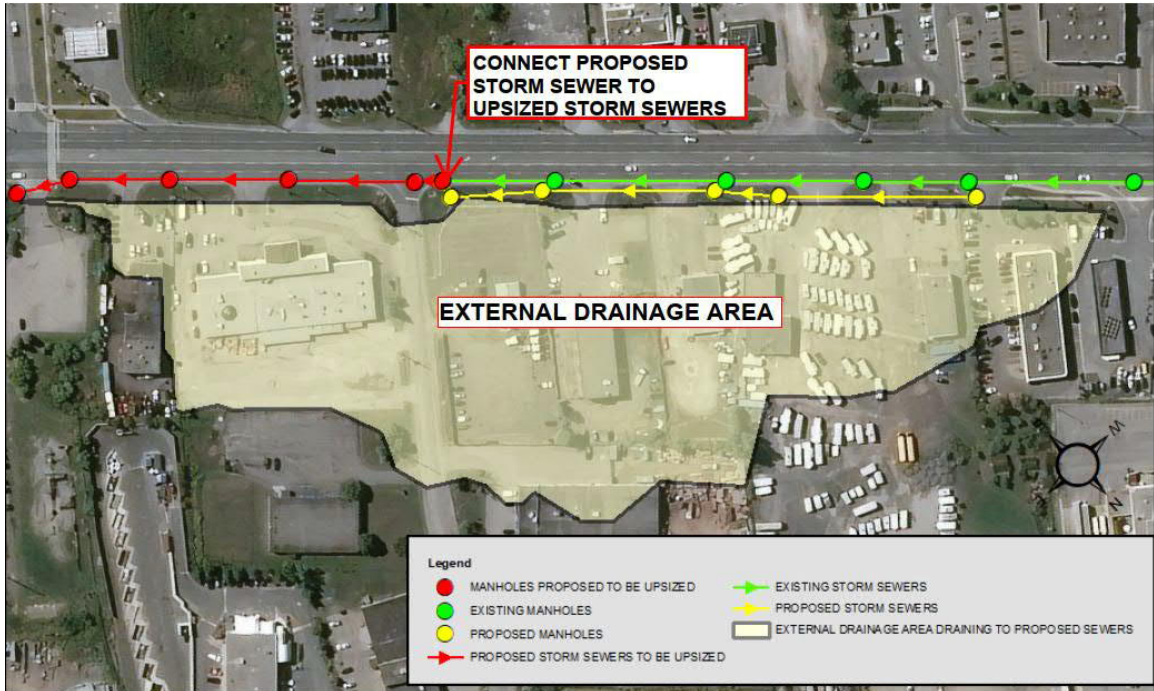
External Drainage Area & Proposed Storm Sewer System (North of RR50 & George Bolton intersection)
